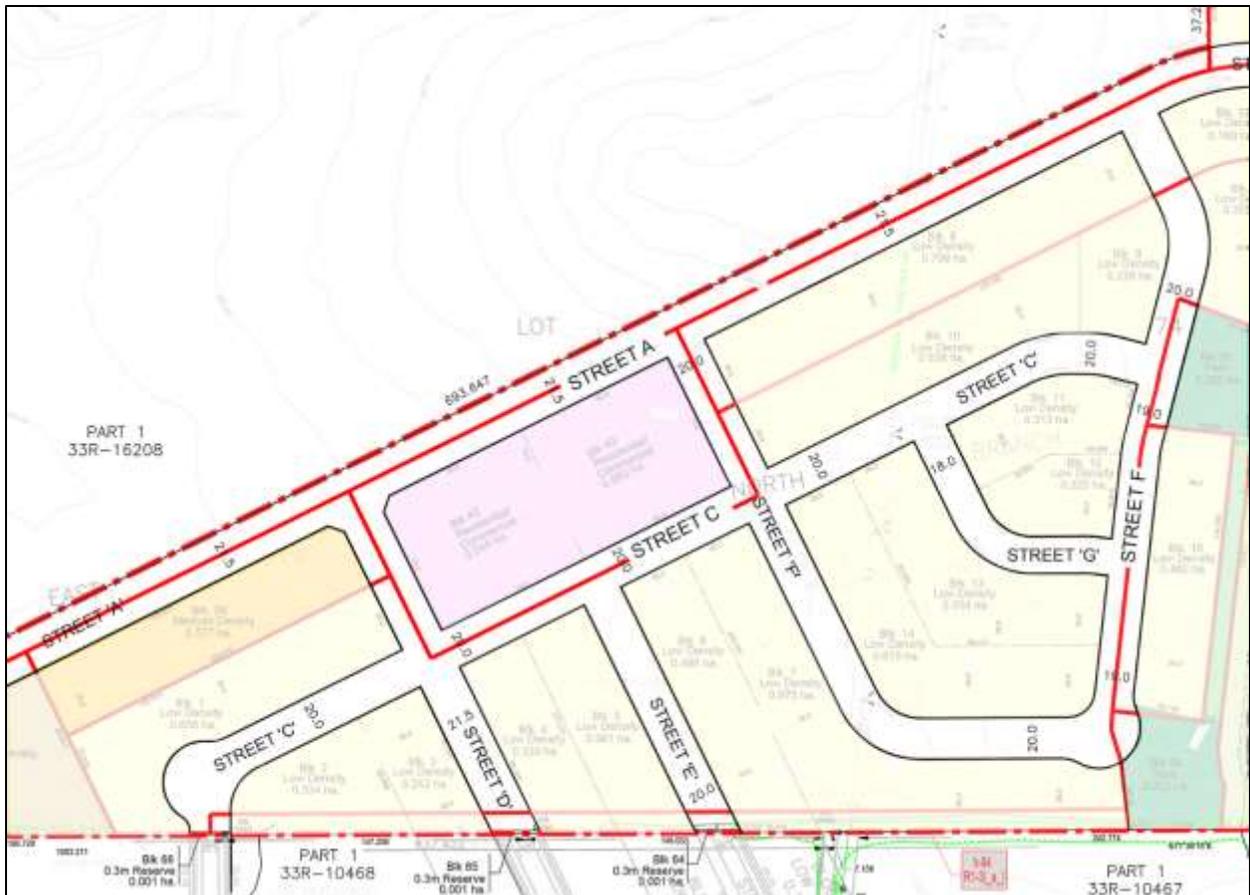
Street C, D, E, F, G (local streets/neighbourhood connectors)
